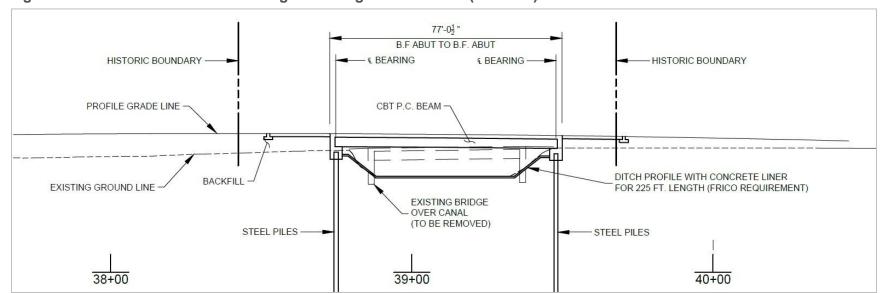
Plan for New Bridge Crossing O'Brian Canal (5AM.477)
